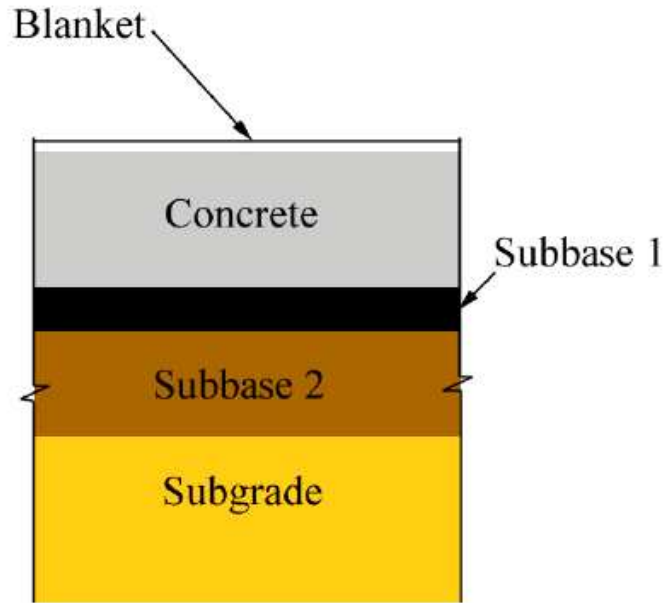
Pavement model used by ConcreteWorks (Riding 2007)
